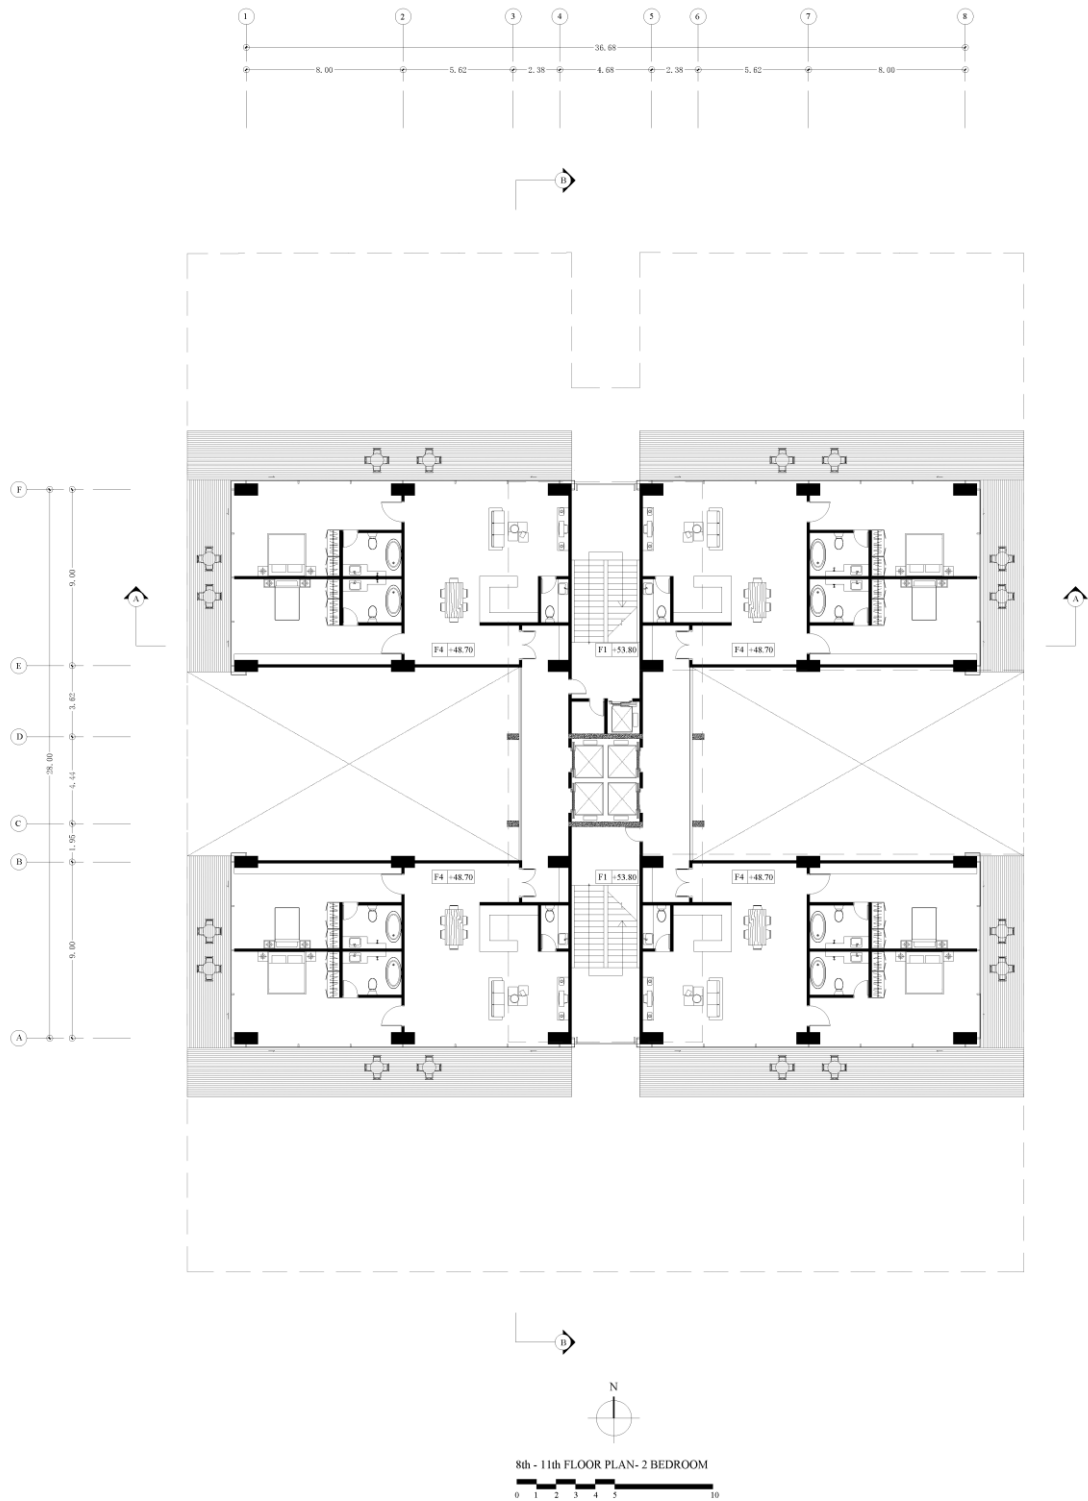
8th to 11th Floor Plan: Two Bedroom Unit, drawn by the author.
